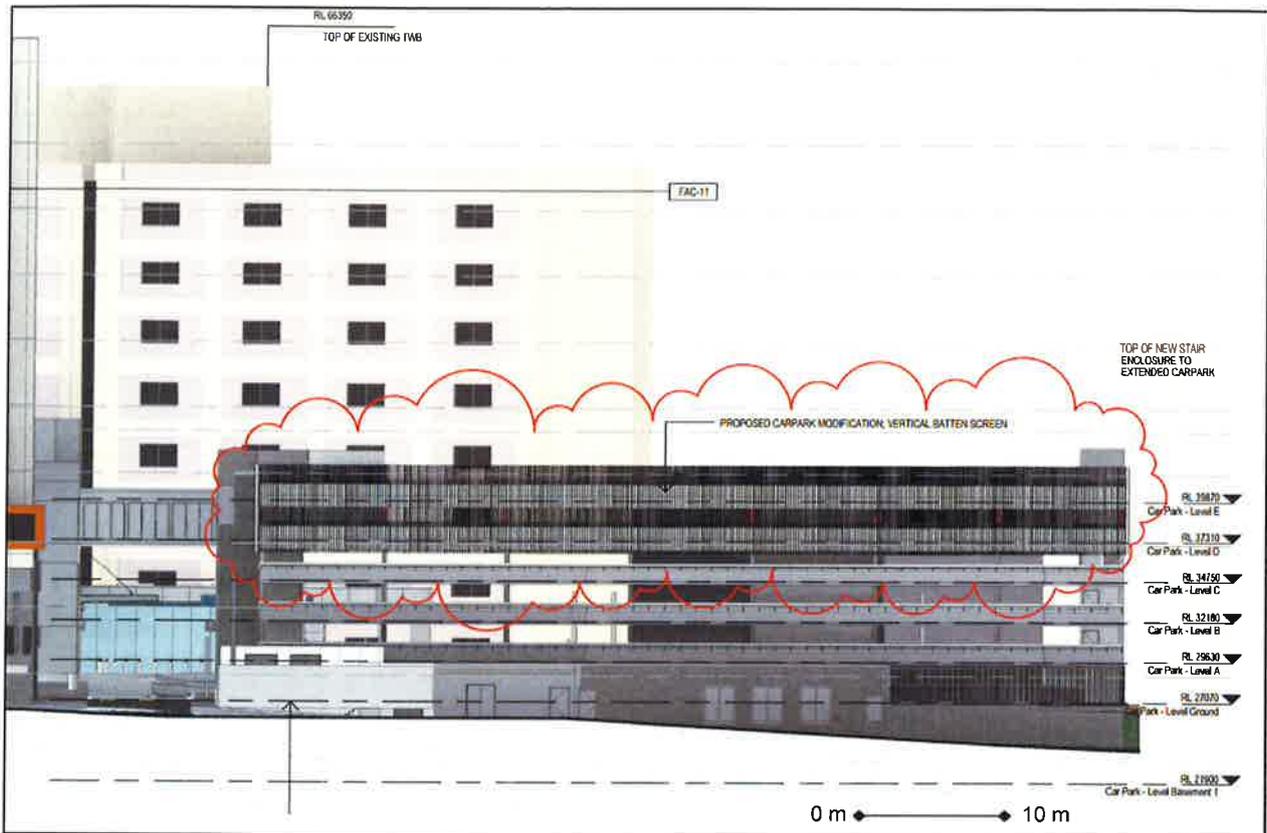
West Elevation - Gray Street Car Park (source: Applicant's Modification Report)
